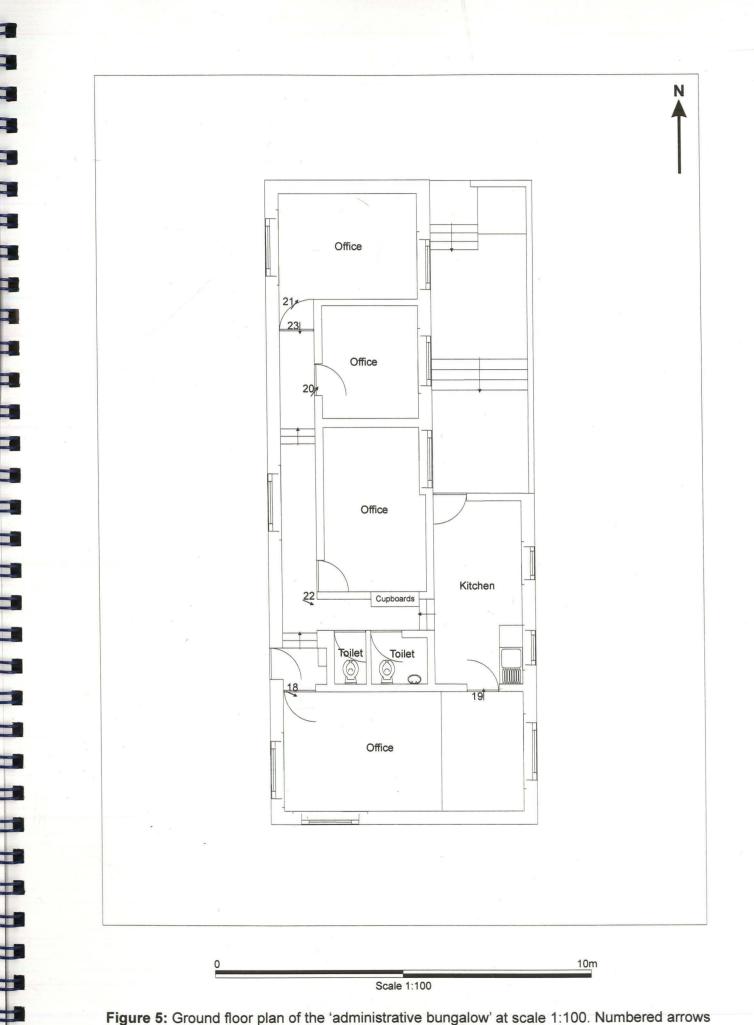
Ground floor plan of the 'administrative bungalow' at scale 1:100. Numbered arrows indicate location and orientation of all ground floor shots. Exterior shots shown on Figure 2.
